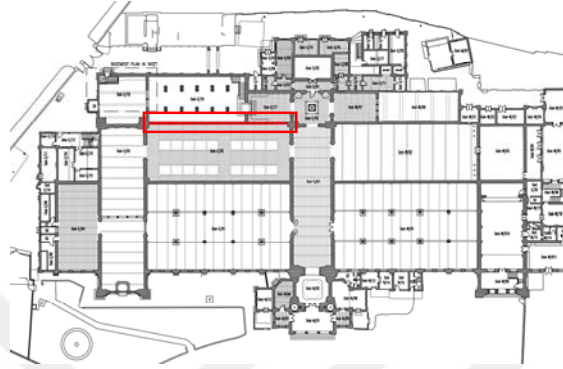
Key Plan showing wall Gnd-E/02-S-W
